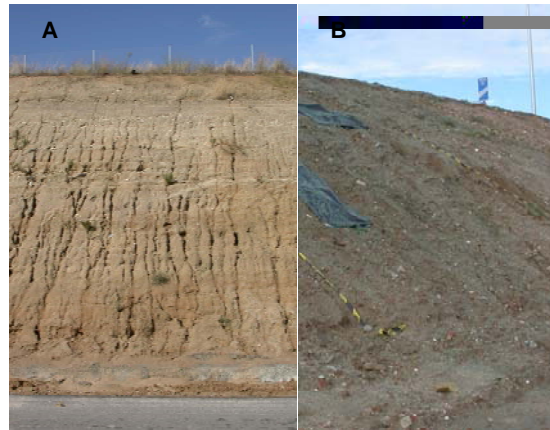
Soil perturbations in roadslopes. A) Roadcut B) Embankment.
